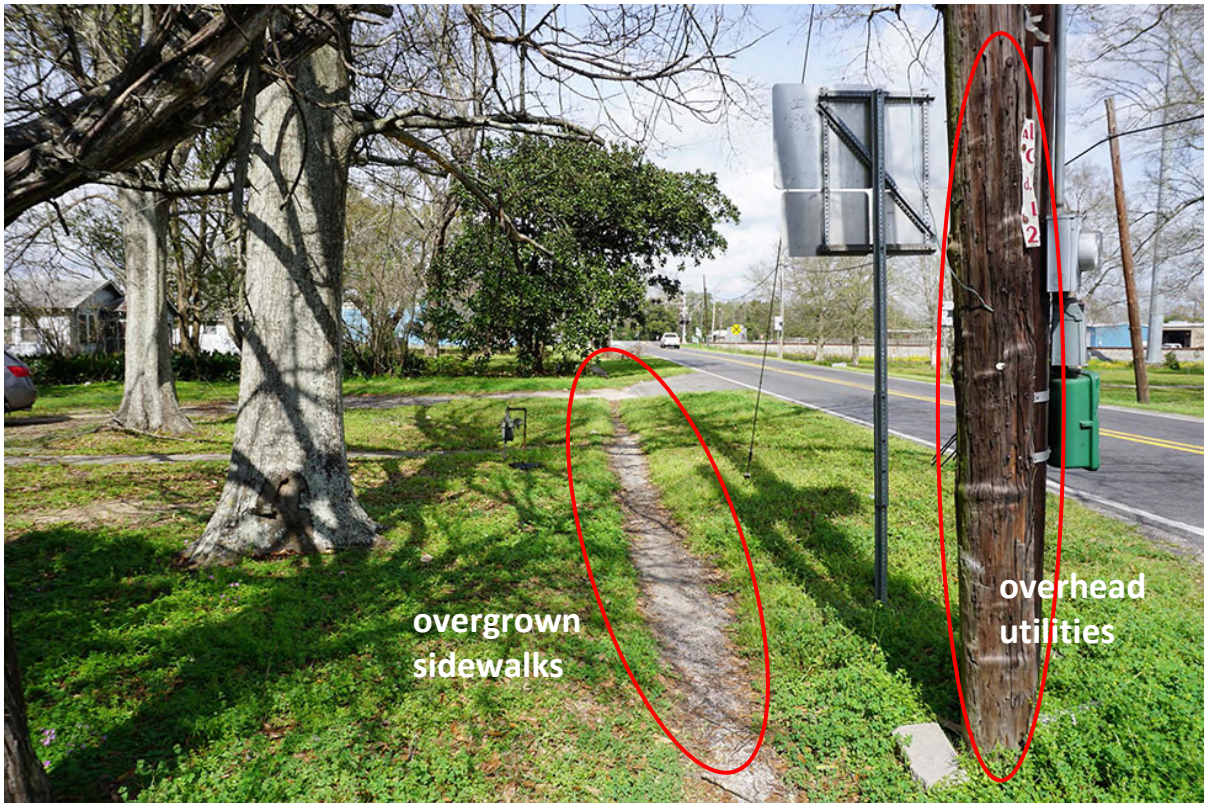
E. 5th St. – overgrown and damaged sidewalks, overhead utilities, and driveway conflicts
